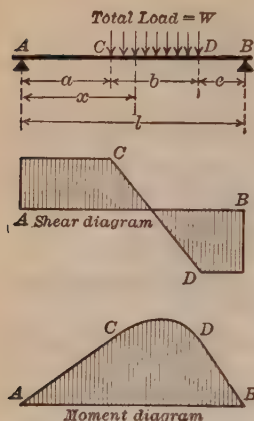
Beam Supported at Ends, Uniform Load over Part of Span.
